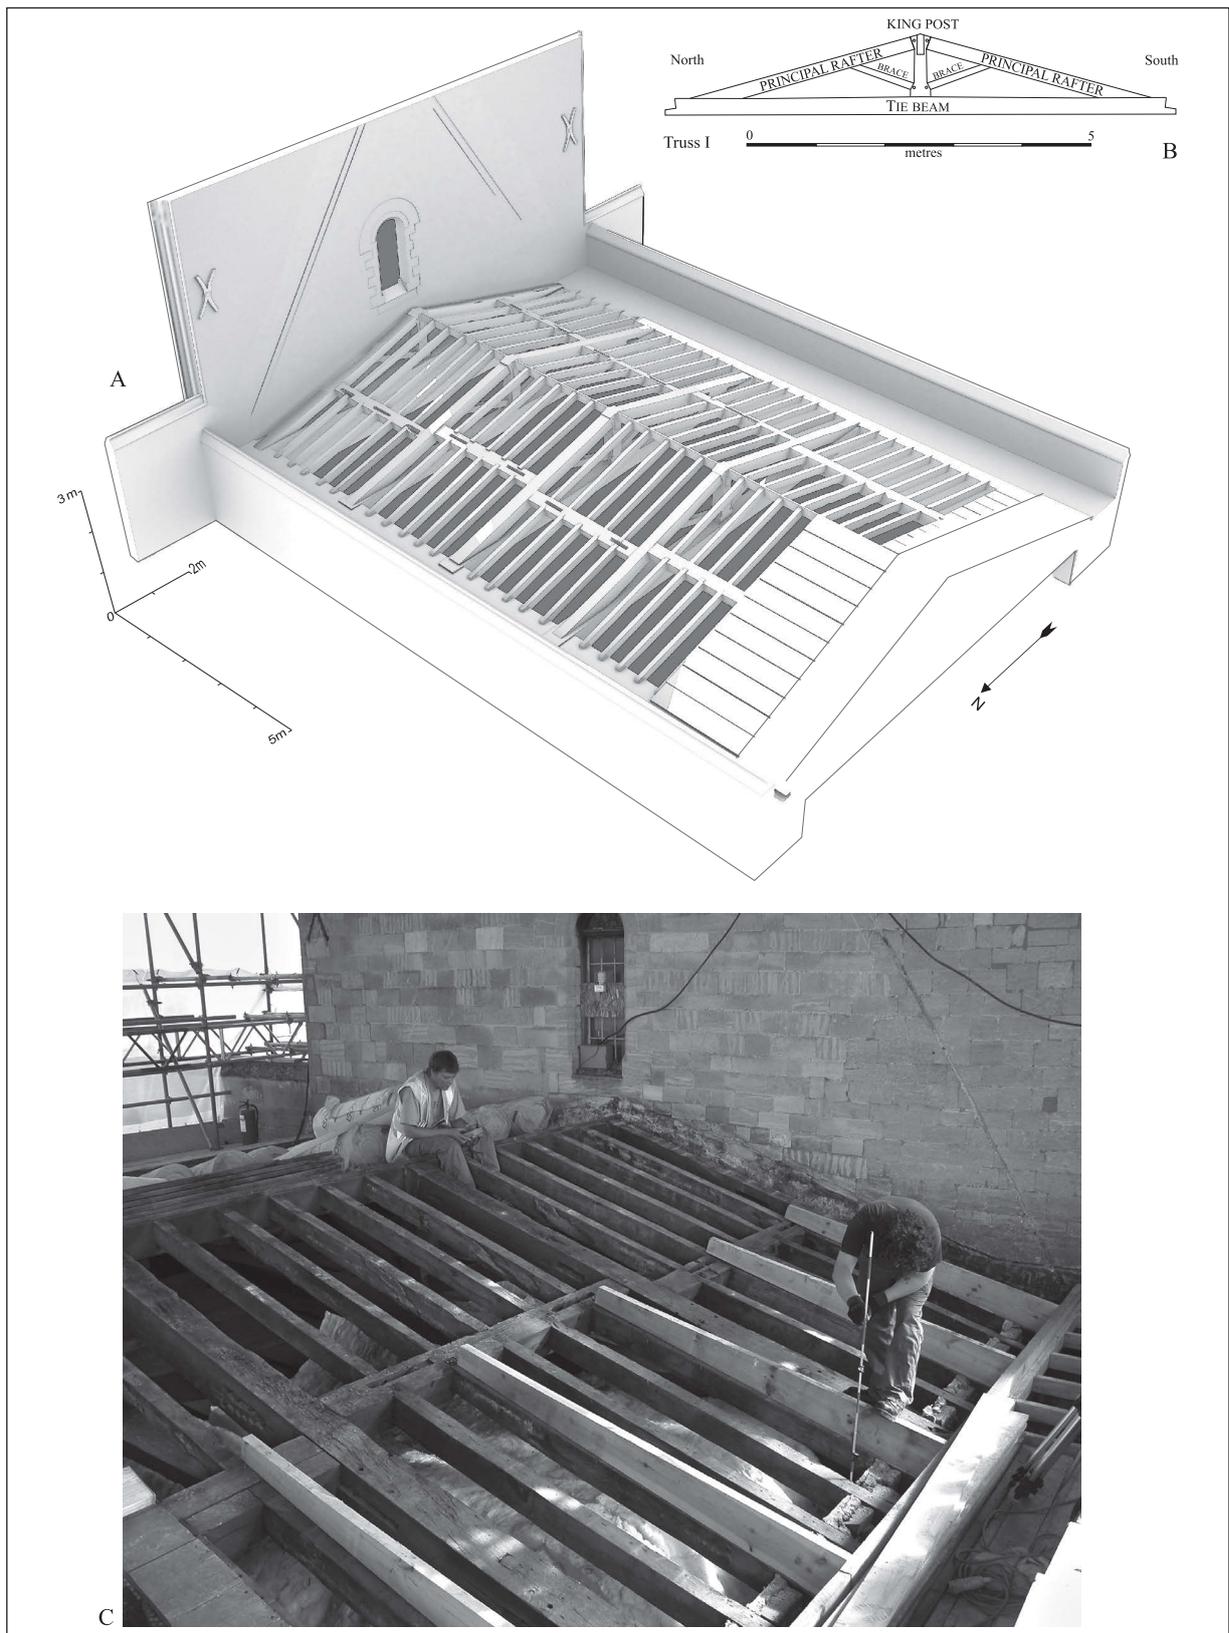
3-D model of the extant nave roof (A) with labelled cross-section of a constituent king post truss (B). (C) 2006 surveying in progress.
